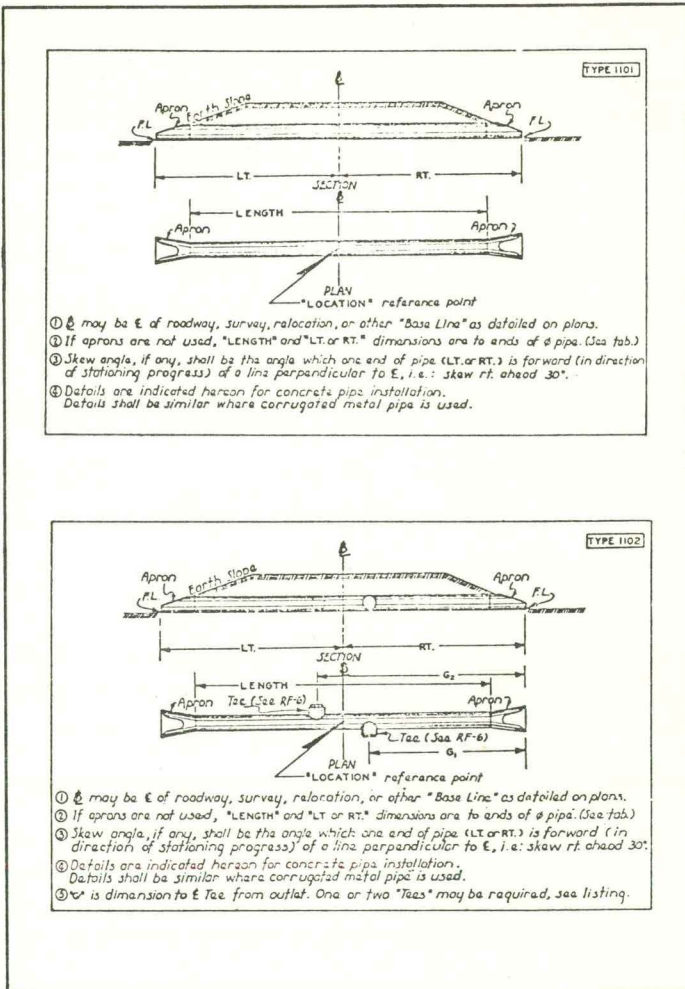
Pipe culvert standard plans 1101 and 1102.
